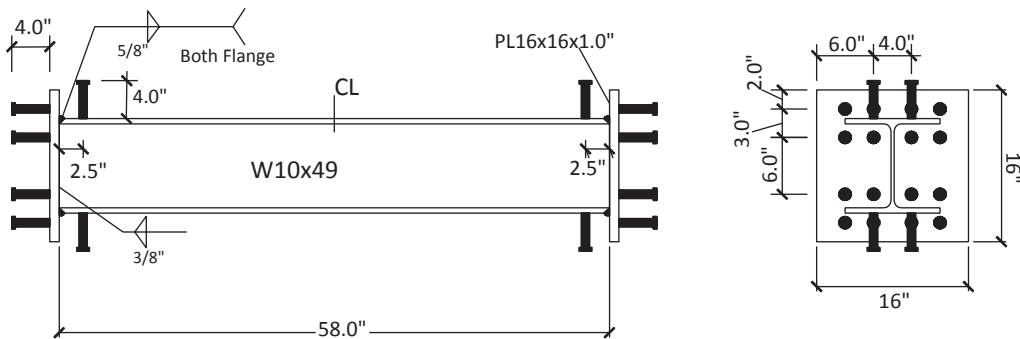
Small piles used in the test to connect the upper and lower slabs.
